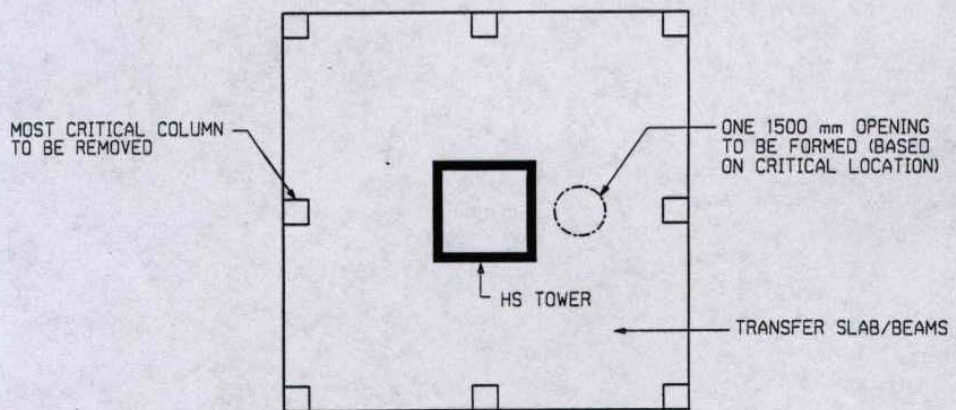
PLAN OF TRANSFER STRUCTURE
